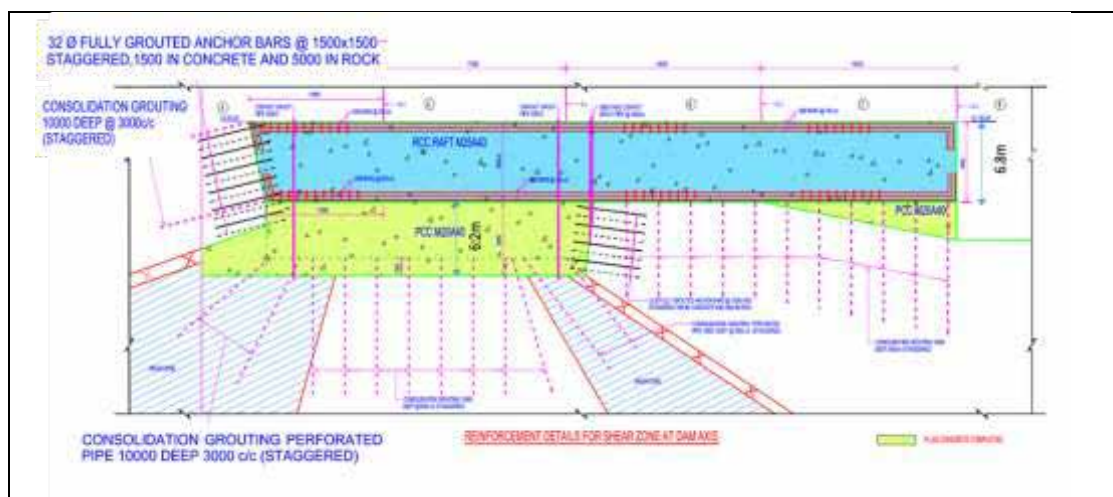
Reinforcement details for shear zone at dam (source: WAPCOS/CWC: Design Drawings of Shear Zone)
